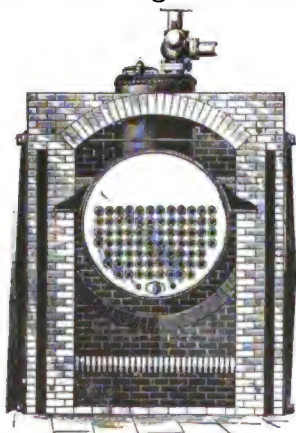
SECTION OF TUBULAR BOILER AND SETTING.
